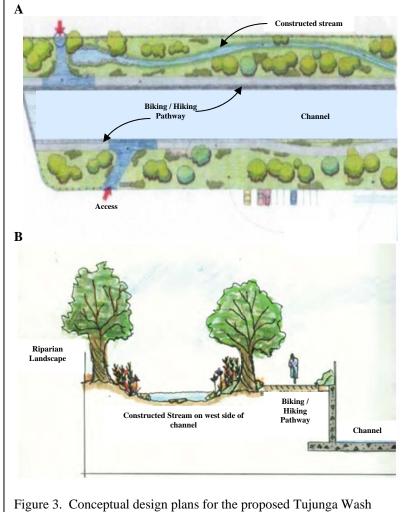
Conceptual design plans for the proposed Tujunga Wash restoration site: (A) overhead view (from U.S. Army Corps of Engineers 2006), (B) cross-section view of stream (from U.S. Army Corps of Engineers unpublished diagram).
